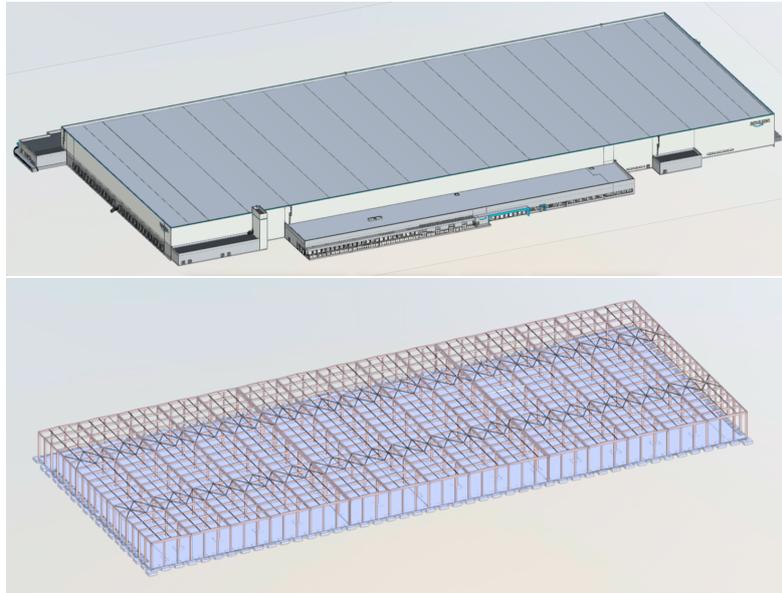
Concrete (IXD) warehouse design overview (top), load-bearing frame, floor slab and foundation pads (bottom)
